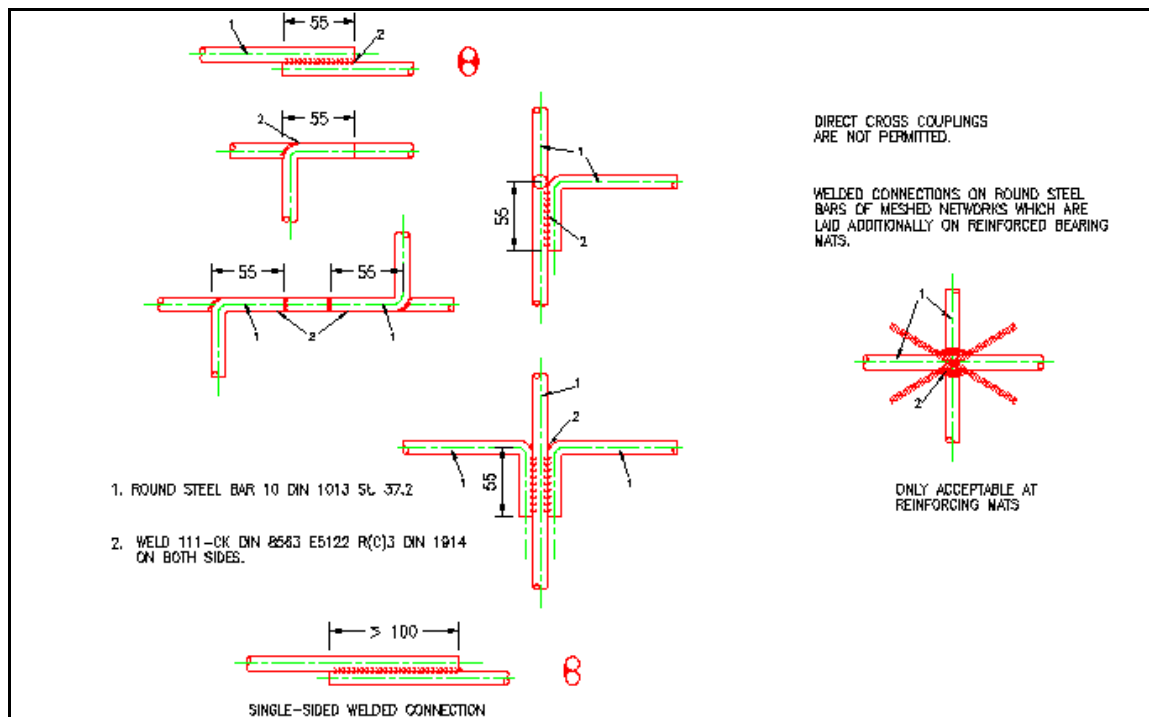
Example of Welded Earthing Connections
